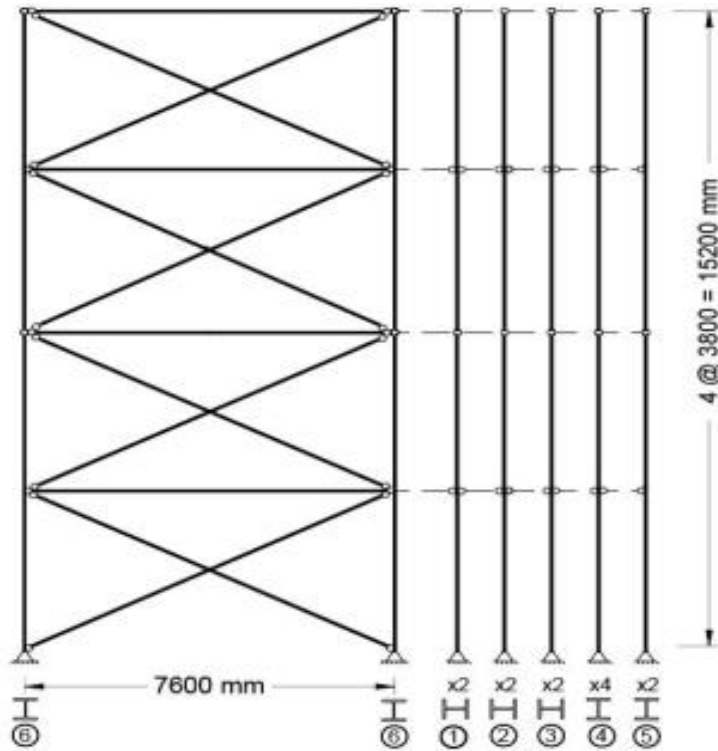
Elevation of the 4-storey CBF with participating gravity columns
